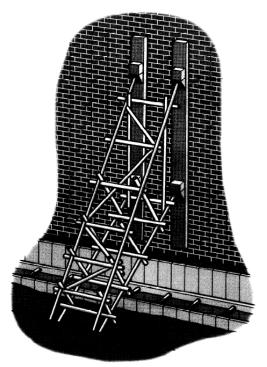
Shoring of building with excavation at base. Care should be taken to ensure that the foundations of nearby buildings or structures are not disturbed or undermined (HSE, 1999).
